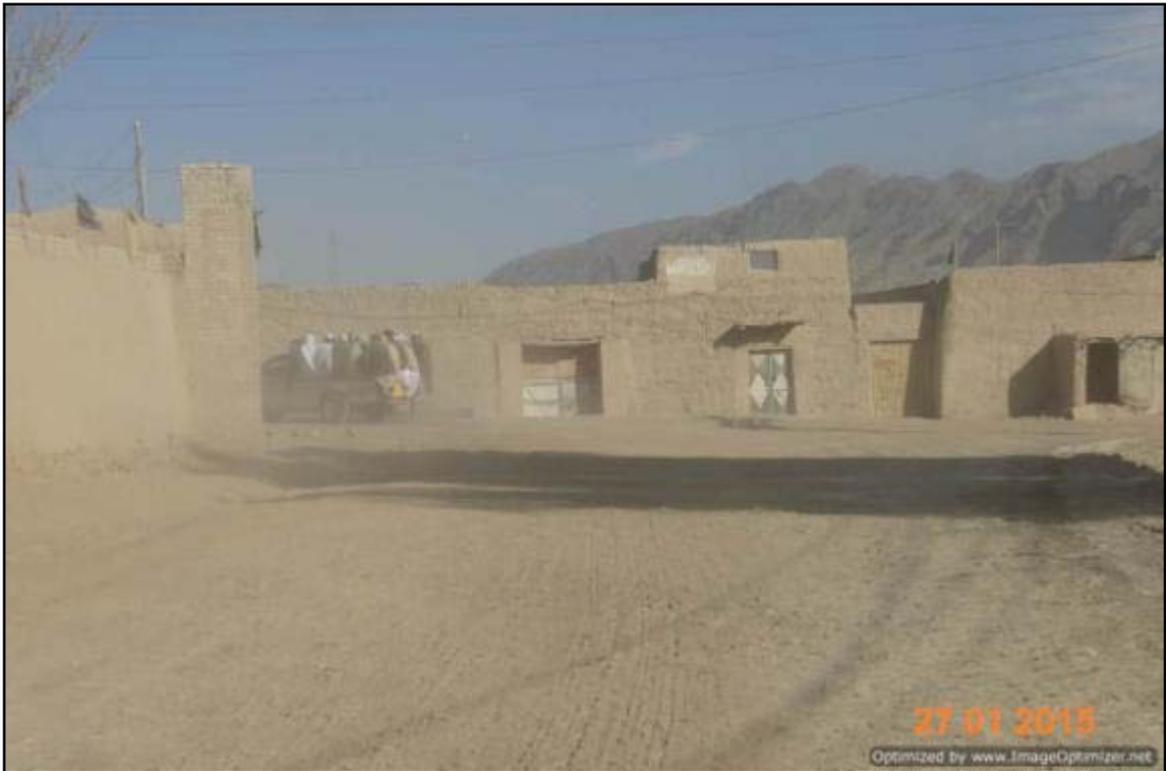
KM: 27+ 000 Bridge construction needs Health and Safety measures & Labor safeguards.
